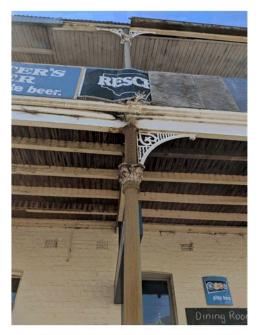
The next column from the SE corner, noting the rotted junction at the floor and loss of gutter at the roof.
